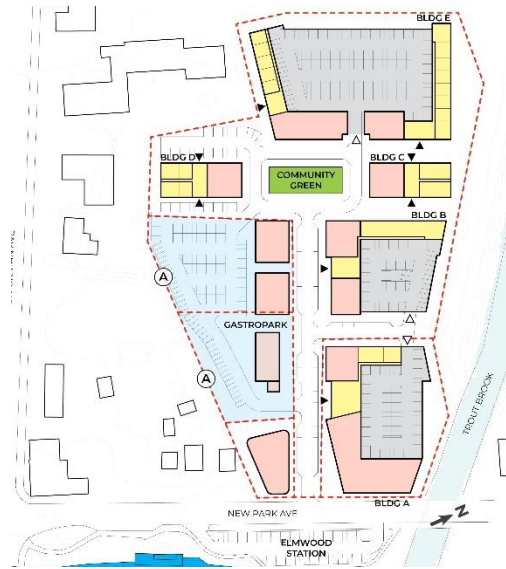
Elmwood Station TOD Test-Fit Ground Floor Plan
